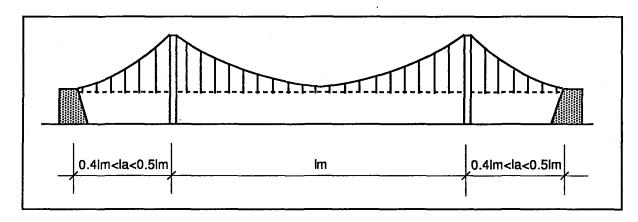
THREE-SPAN SUSPENSION BRIDGE WITH LONG SIDE SPANS
